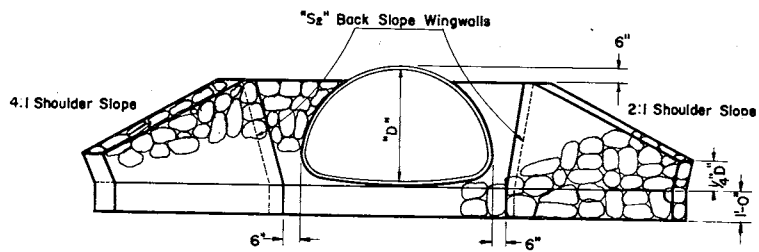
DETAILS OF PRIVATE ENTRANCE AND SIDE ROAD APPROACHES
